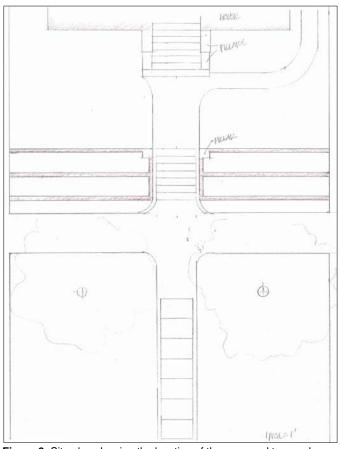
Site plan showing the location of the proposed terraced retaining wall.
